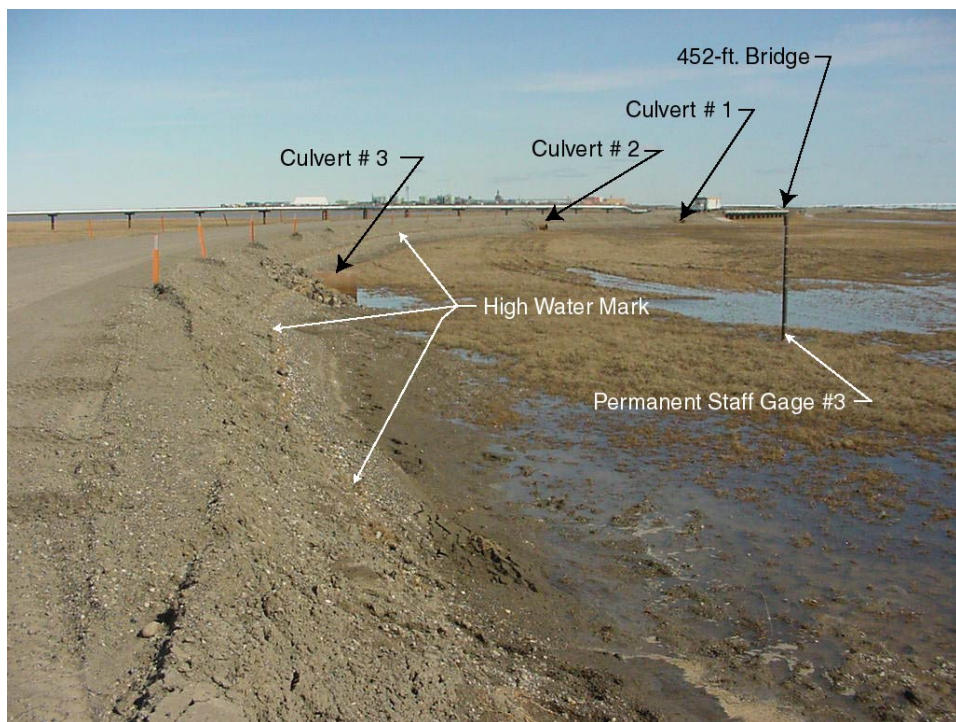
Facing east along the south side of the CD-2 access road from the 62-foot bridge. (6/16/01)
